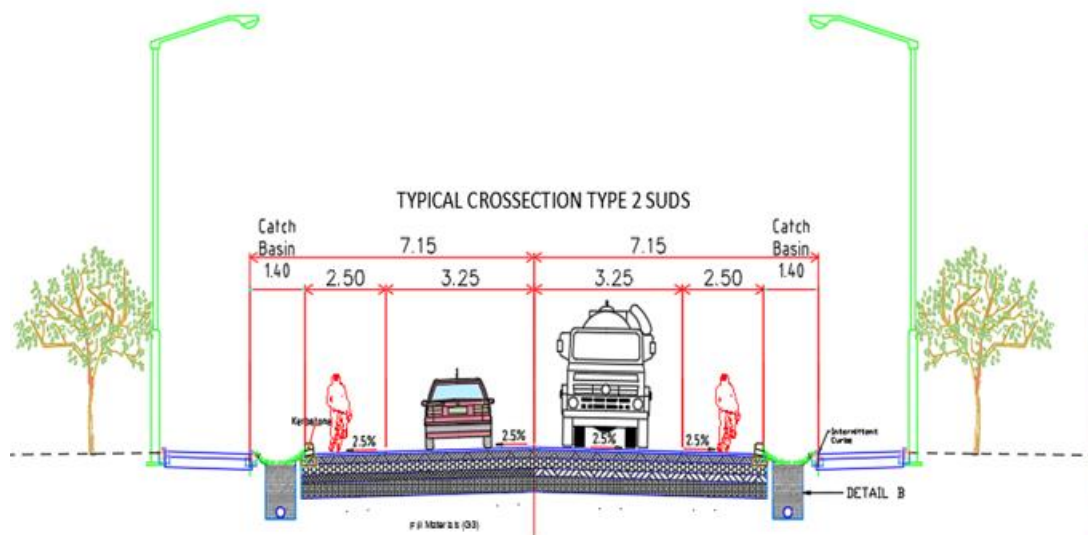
SUDS Details for Typical Cross section Type 2 SUDS
